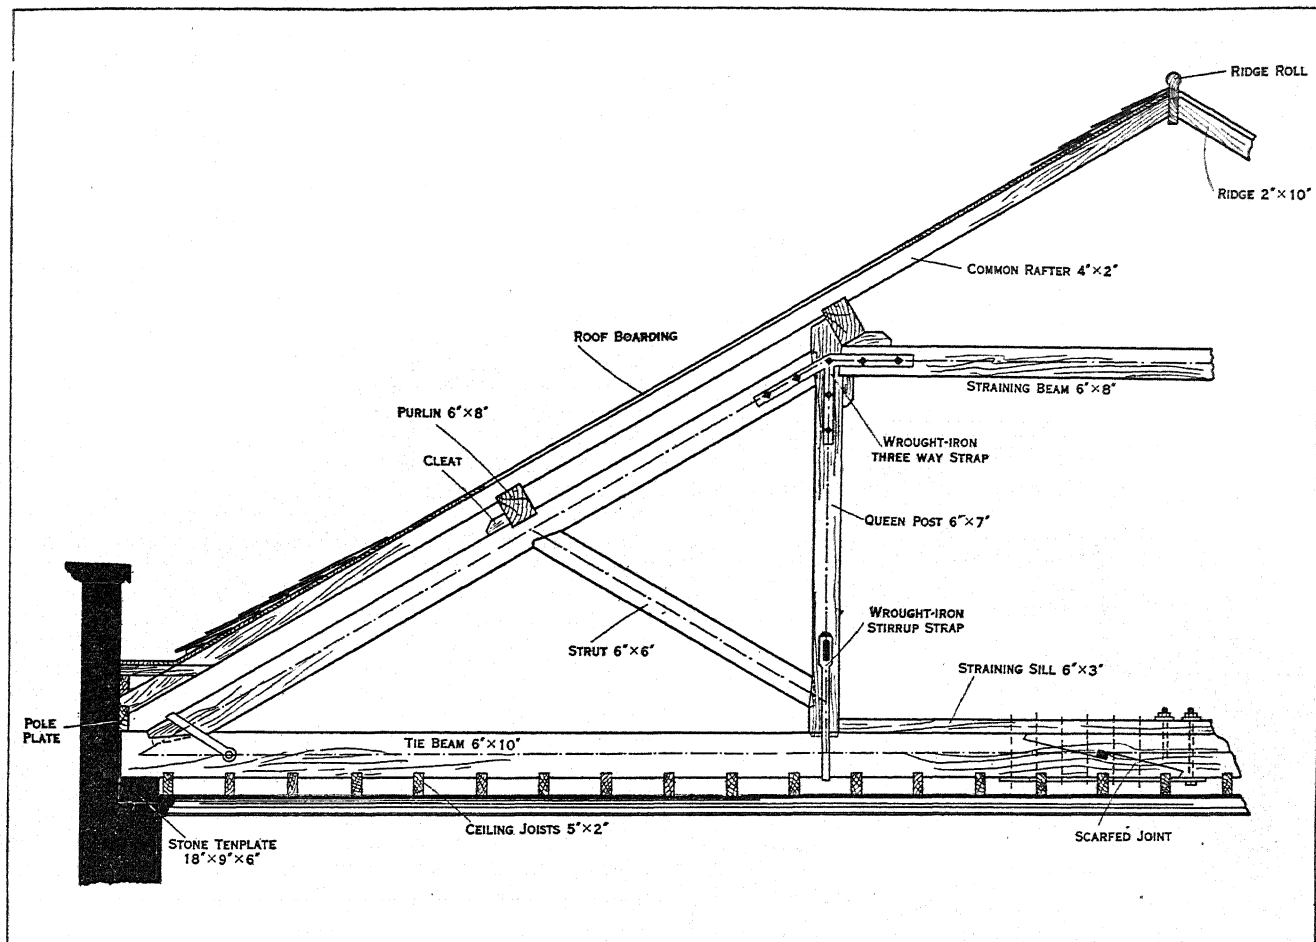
QUEEN-POST ROOF TRUSS: HALF ELEVATION, 38 FT. SPAN
